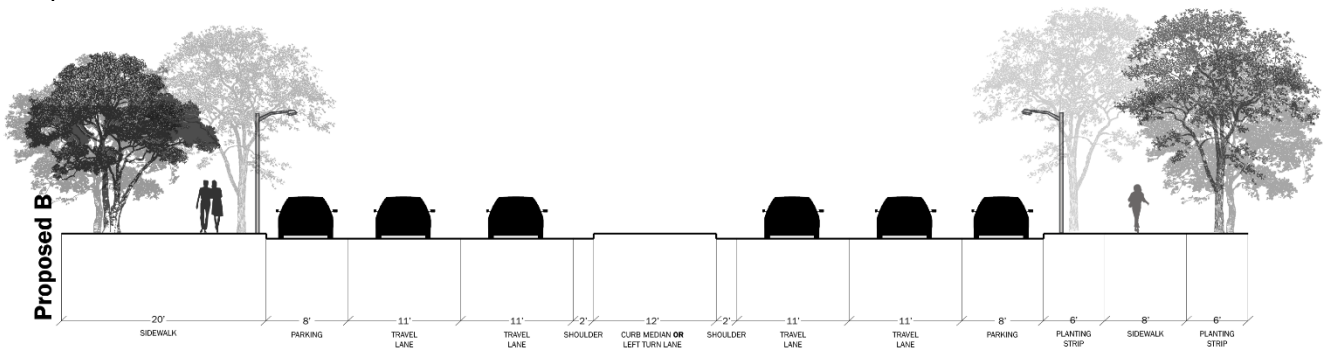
Proposed Boulevard Concept cross section, State Street (13th Street to 20th Street)
